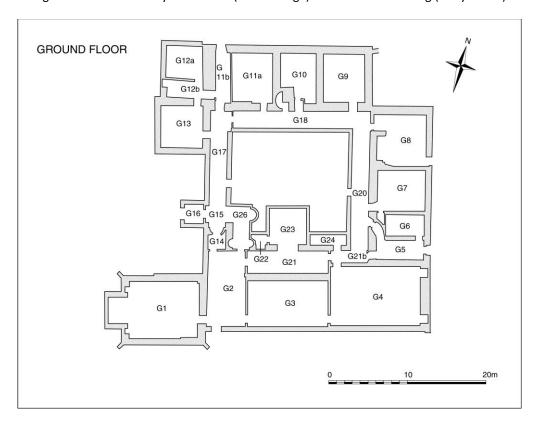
Plan of the Abbey Ground Floor (West, North and East Ranges) with South Range raised Ground Floor (Andy Isham)
